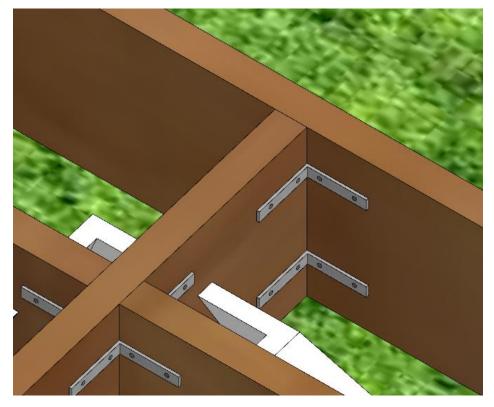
3D sketch showing the connection reinforcement of the perimetral beams
